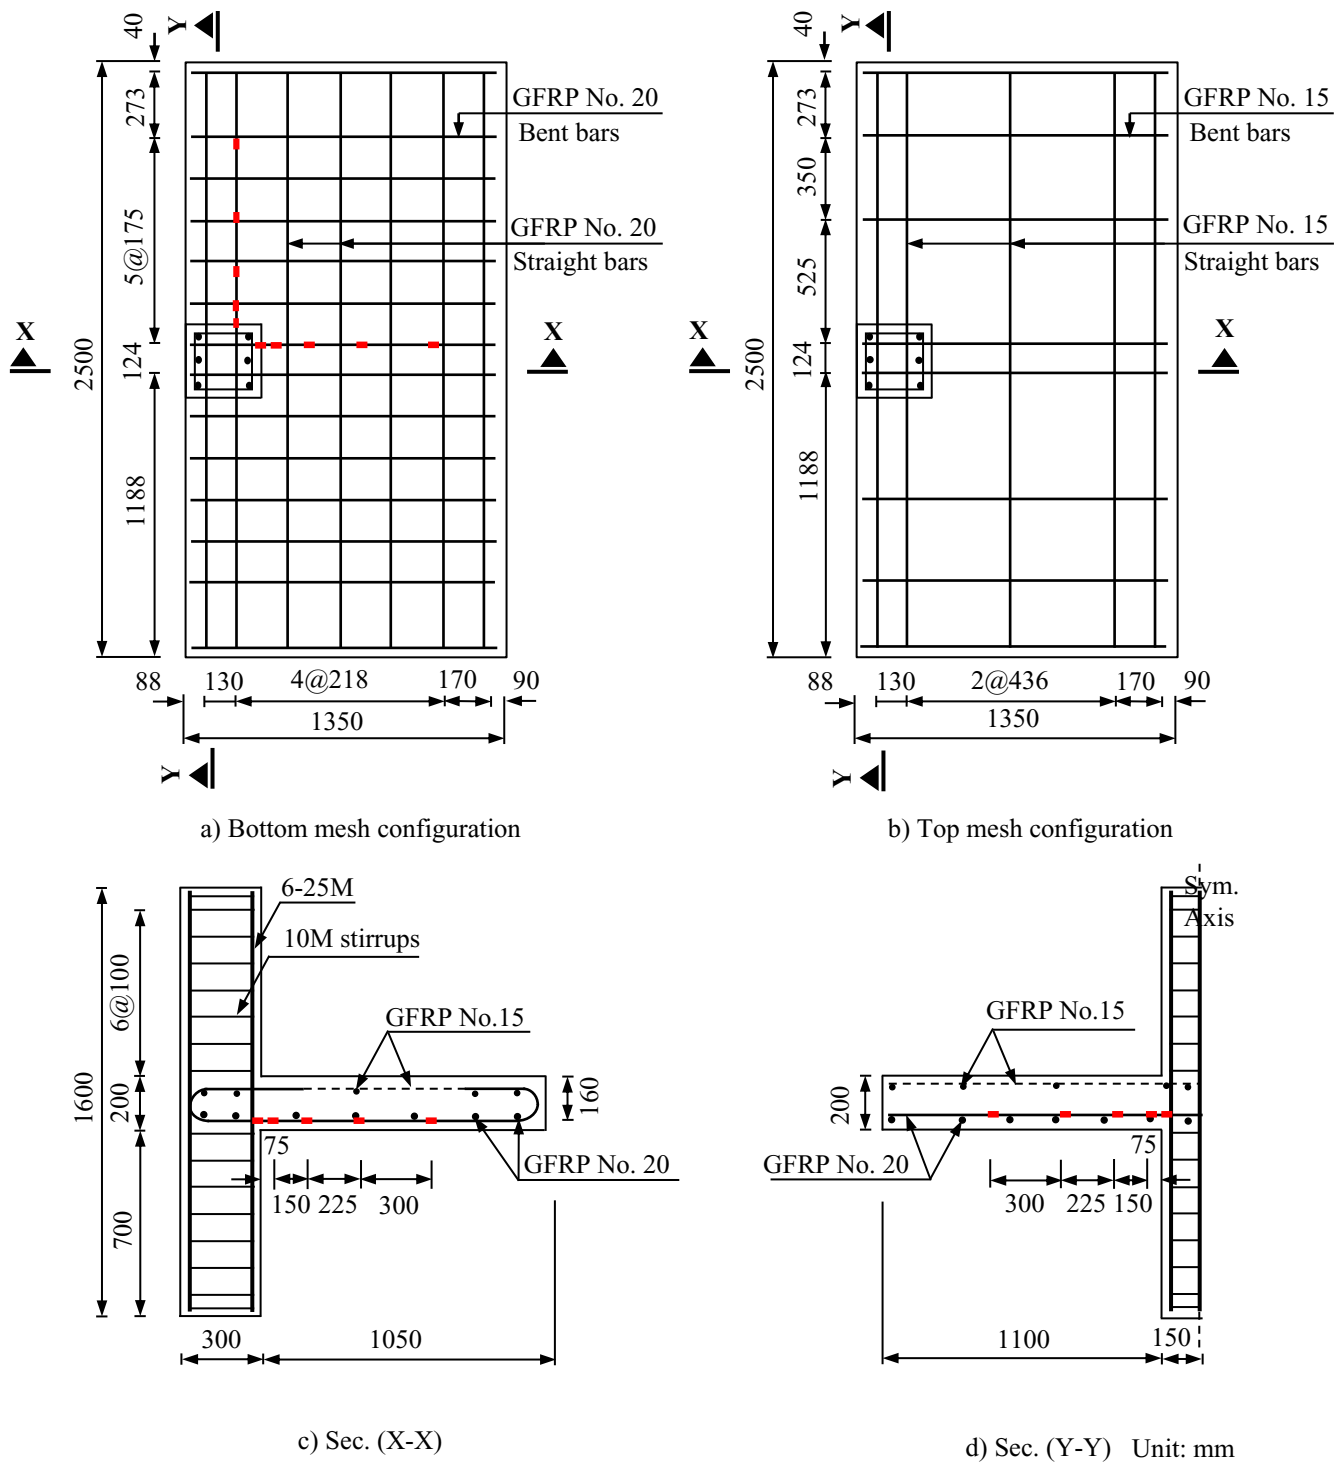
Connections concrete dimensions and reinforcement configuration
